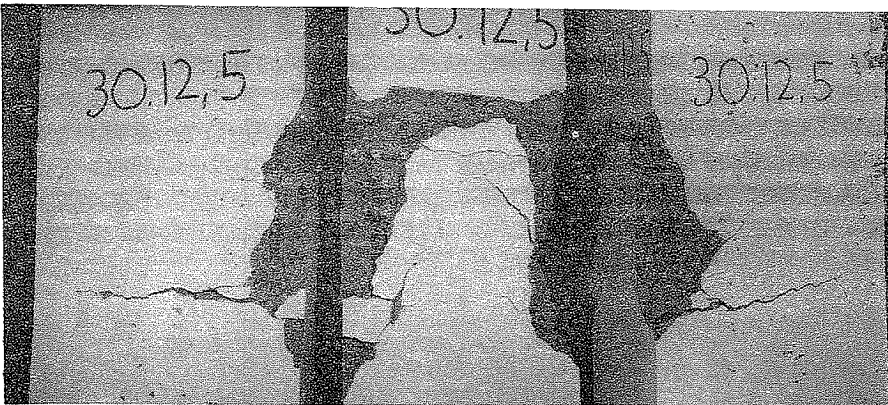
Failure of S.B.-specimen No. 30/12.5.
